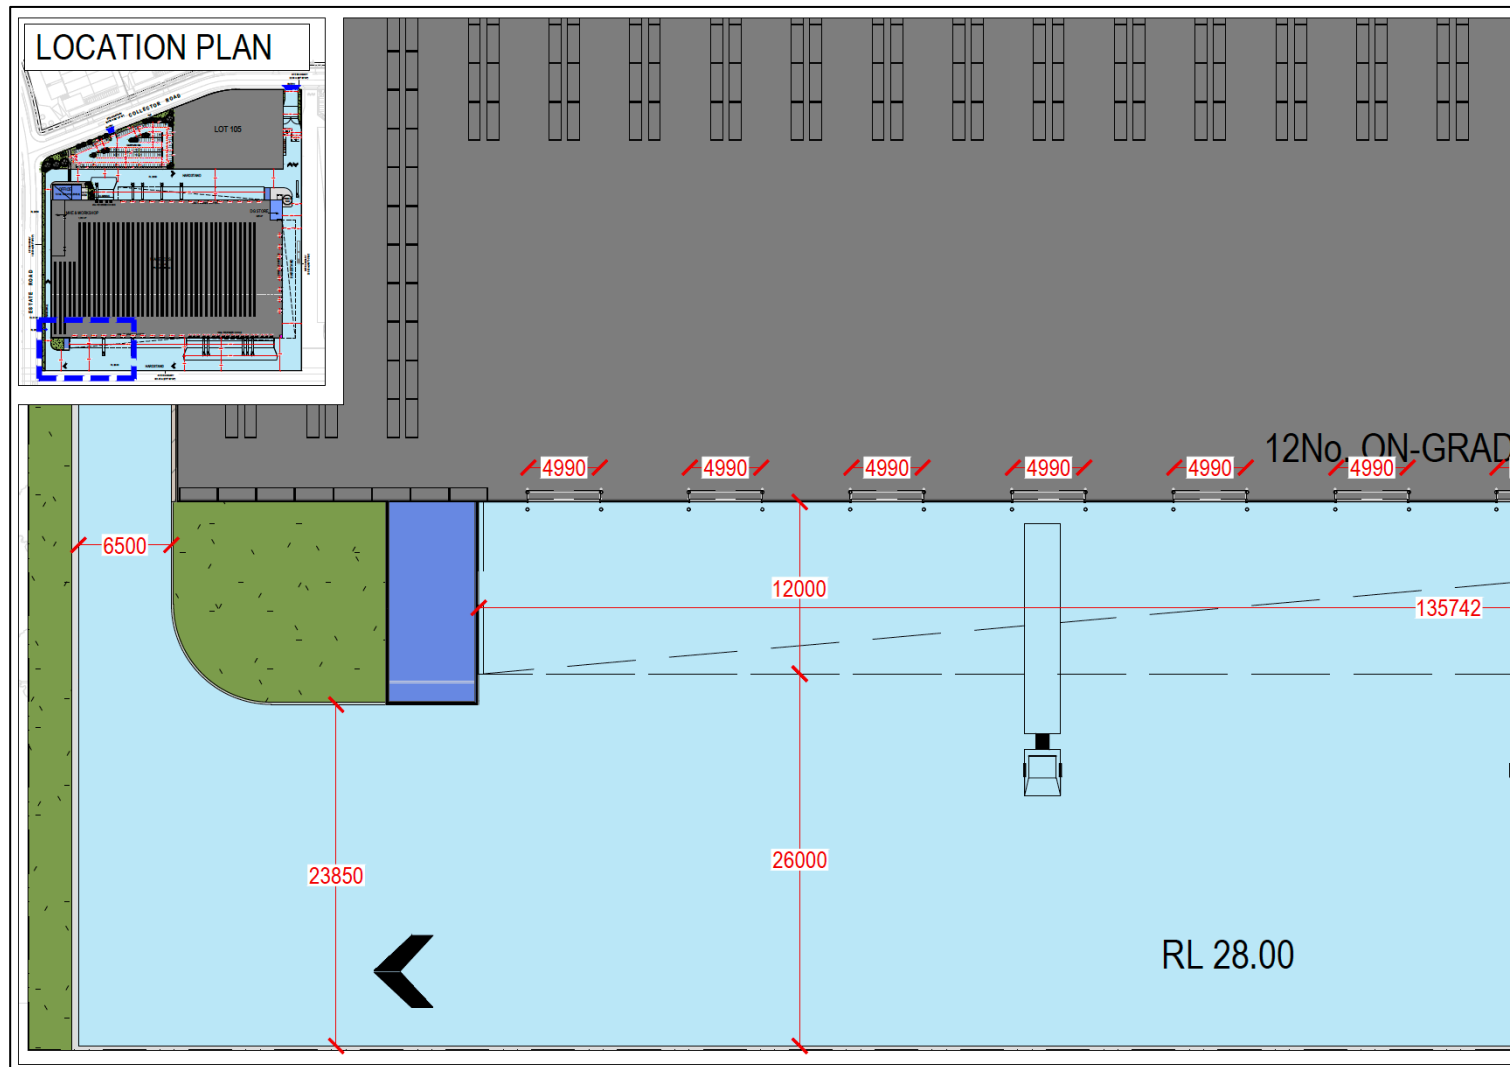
PROPOSED CAR PARKING LAYOUT AND DIMENSIONS
